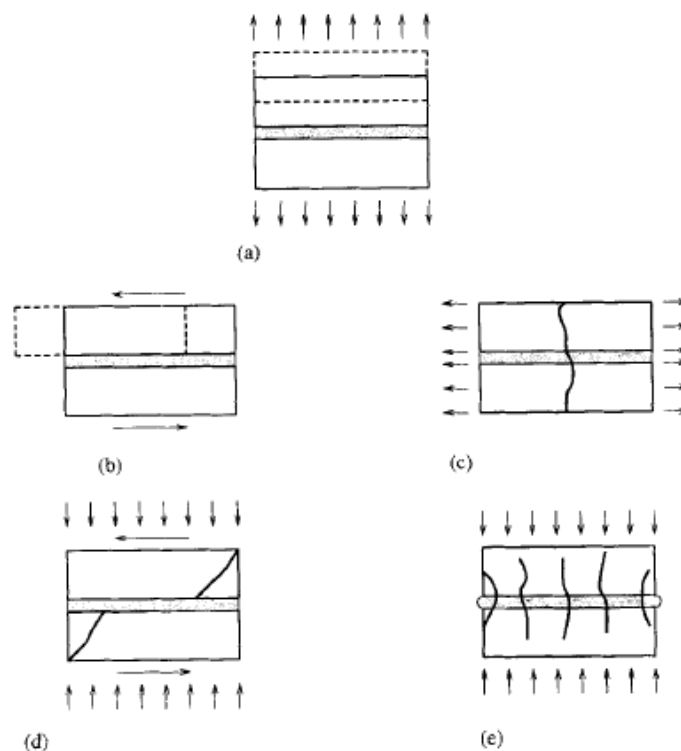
Failure Mechanisms of Masonry: (a) Joint Tension Cracking; (b) Joint Slip; (c) Unit Direct Tension Crack; (d) Unit Diagonal Tension Crack; (e) Masonry Crushing
